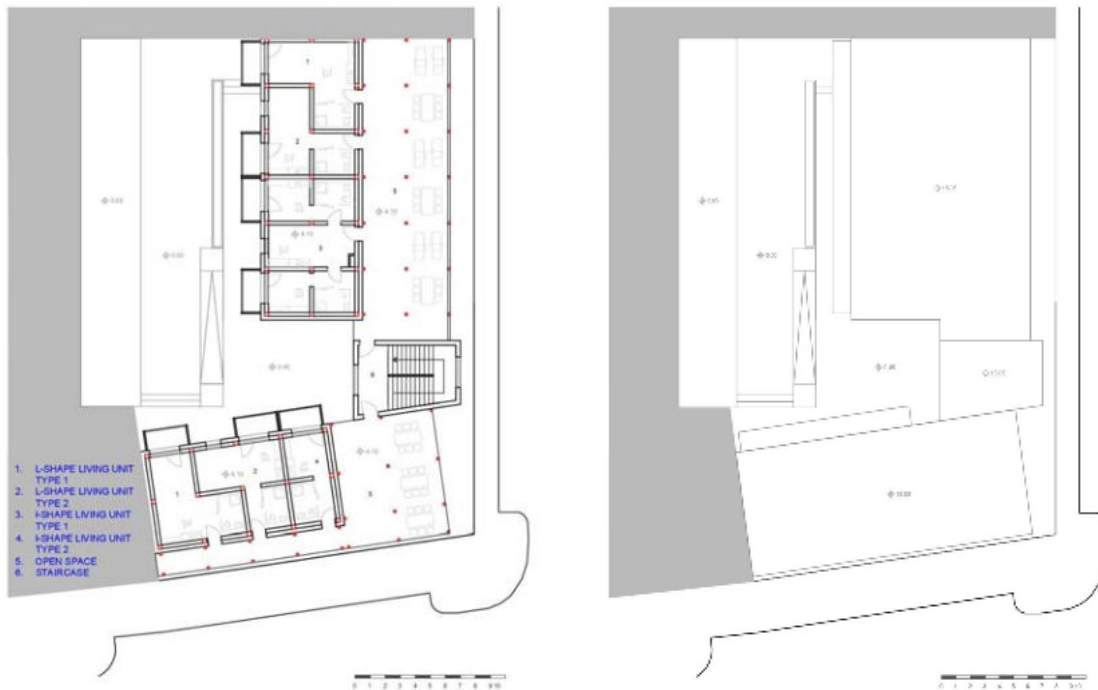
Gapsolutely fitting – Standard floor plan and roof plan<sup>48</sup>
